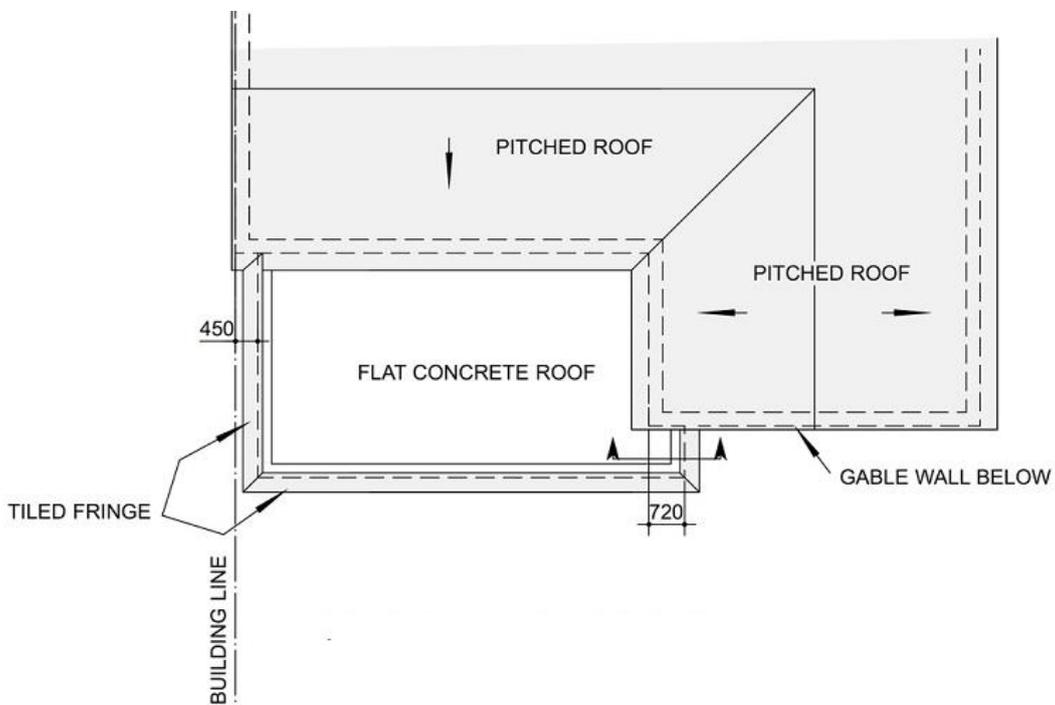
Typical relationship of flat roof extension to an L-shaped pitched roof area which has a gable on the side building line.
